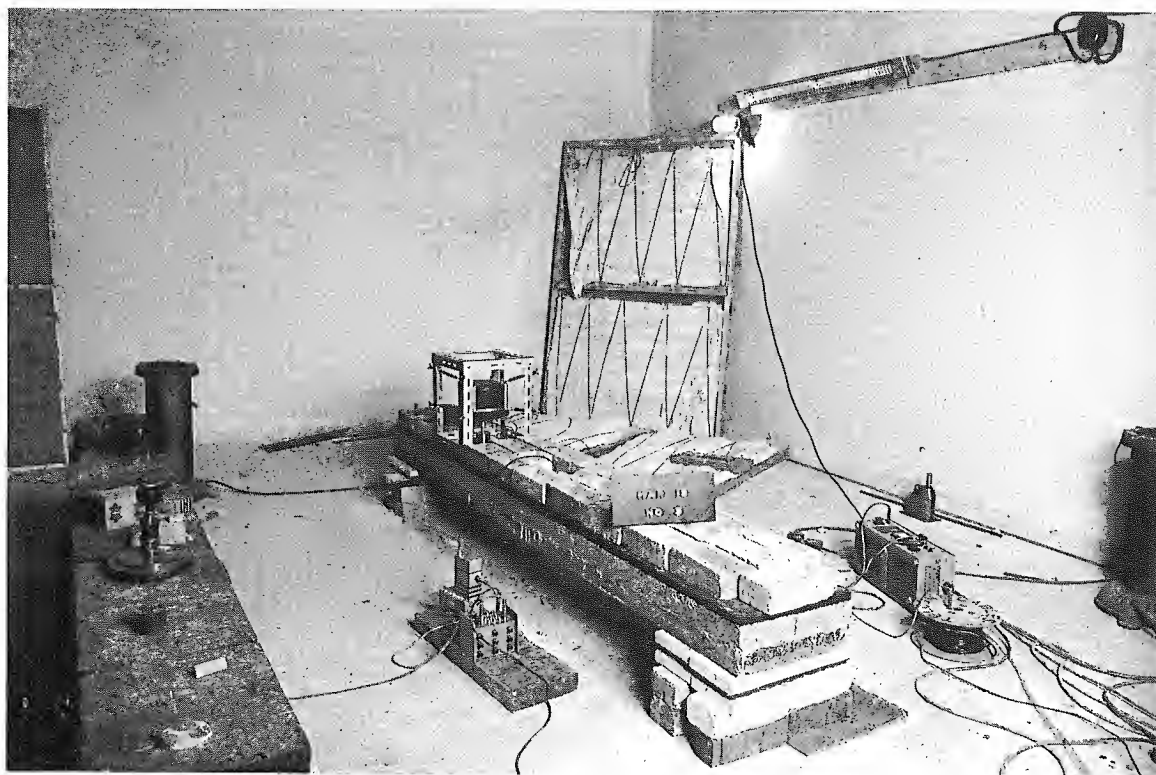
Photograph of pre-stressed concrete planks mounted on rubber pads
